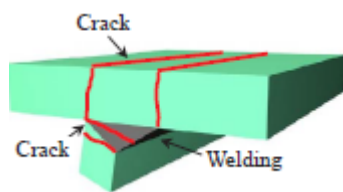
Crack pattern in deck-to-trough connection [9]
